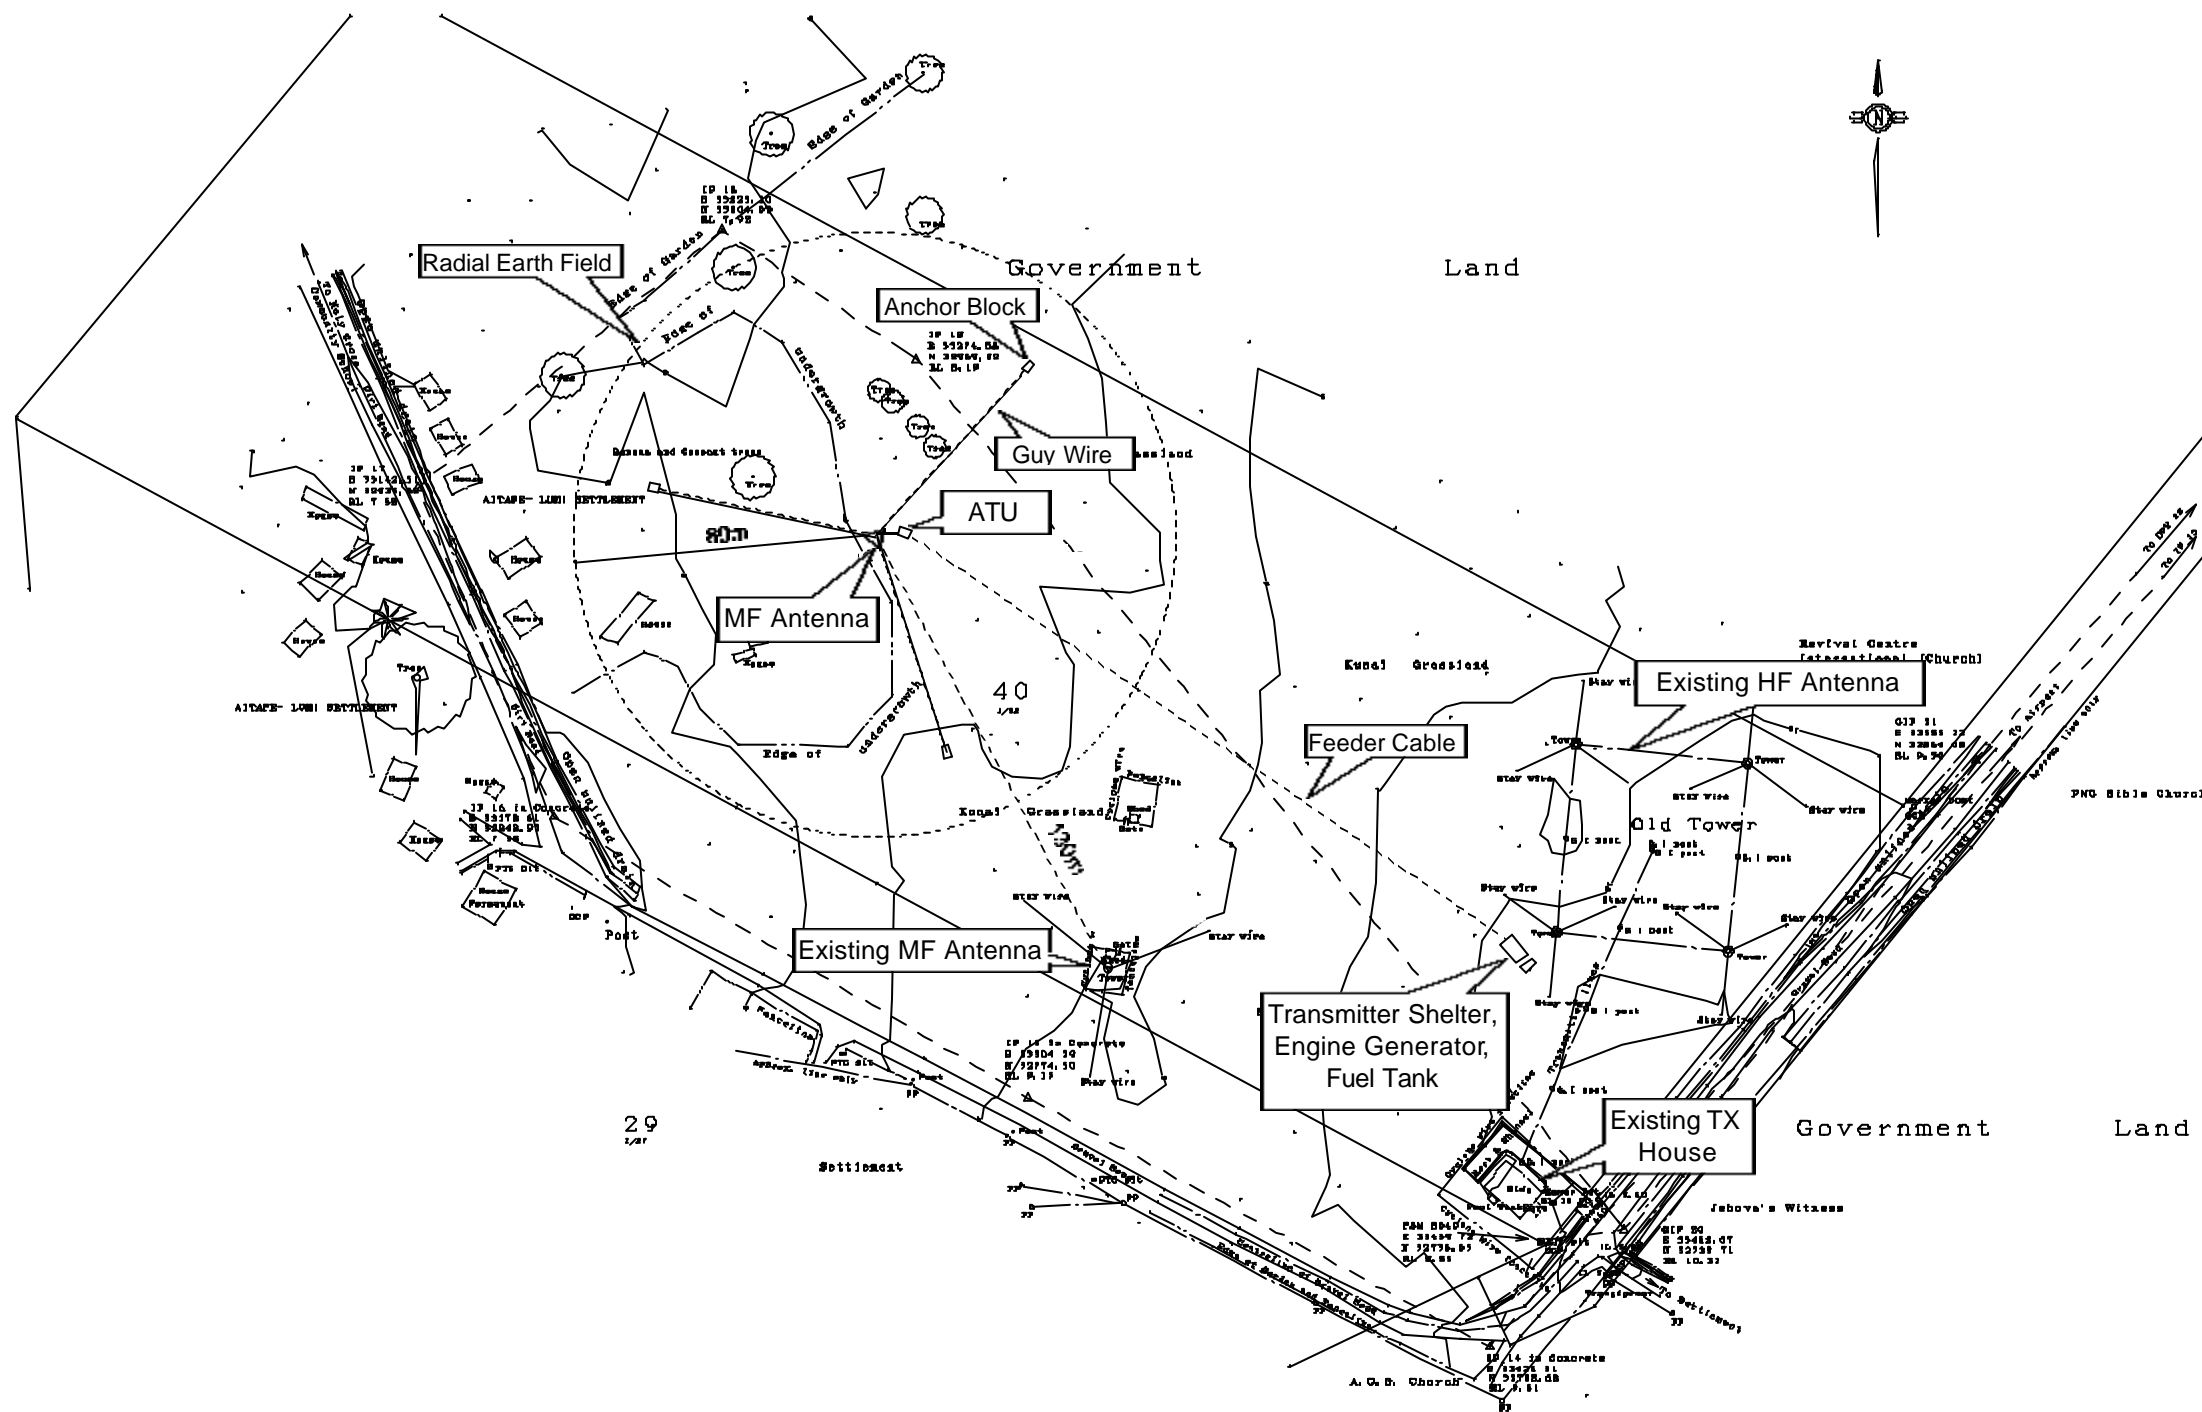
Vanimo MF Radio Station	Site Layout of MF Transmitting Station	S=1:2,000
